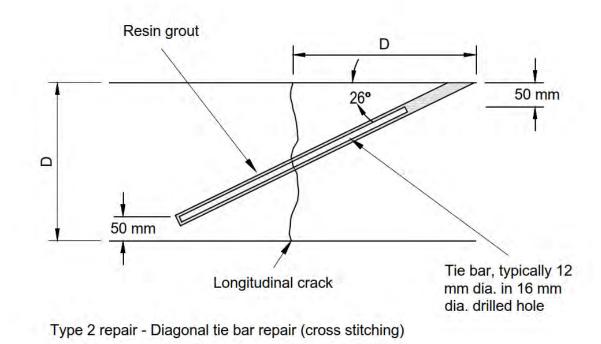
Type 2 repair - Diagonal tie bar repair (cross stitching)
